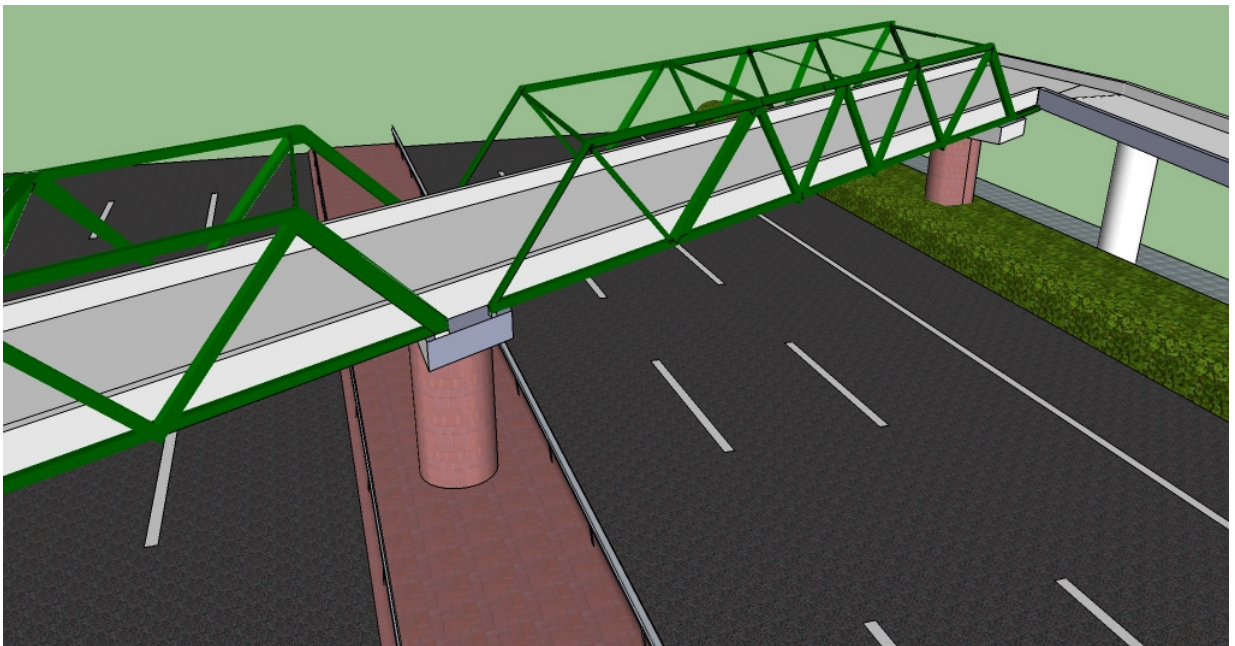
B: Three dimensional view of the bridge deck on steel truss, bearings & ramp connection
